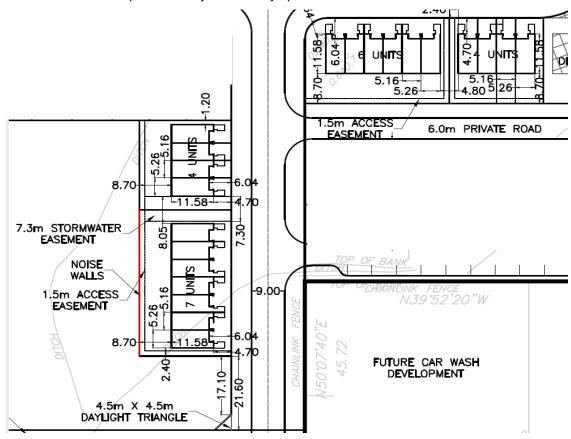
Proposed Three-Storey Townhouse Units within Preliminary Site Plan, prepared by IBI Group
